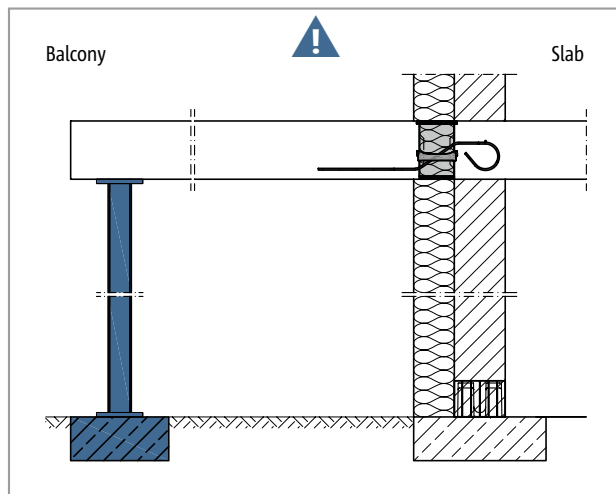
Schöck Isokorb® XT type Q: Continuous support required
